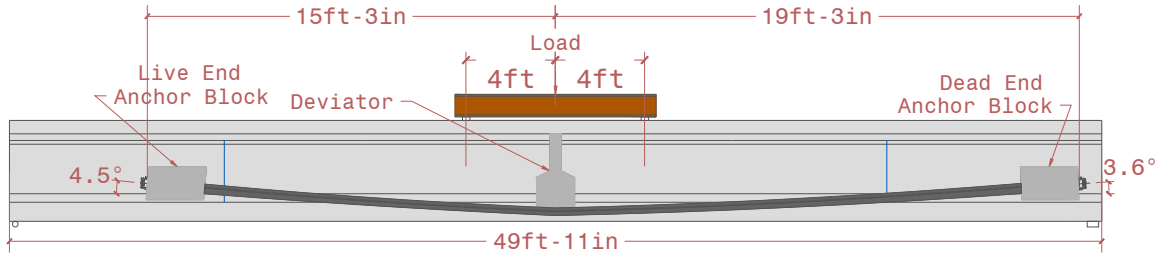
Elevation View of External PT Repair on Lesner Bridge Beam
